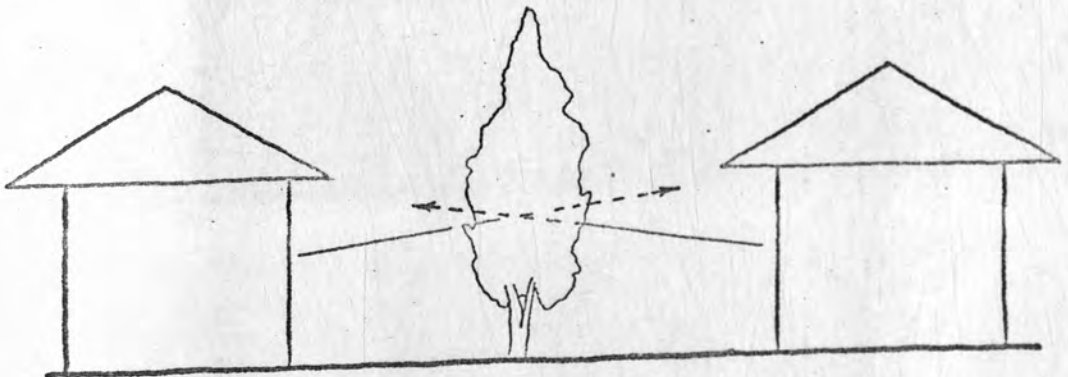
Landscaping - Elevated Topography With Vegetation No Barriers Across Street (Sound Transmission: Motor Vehicles, Pedestrians To Exterior Of House)
